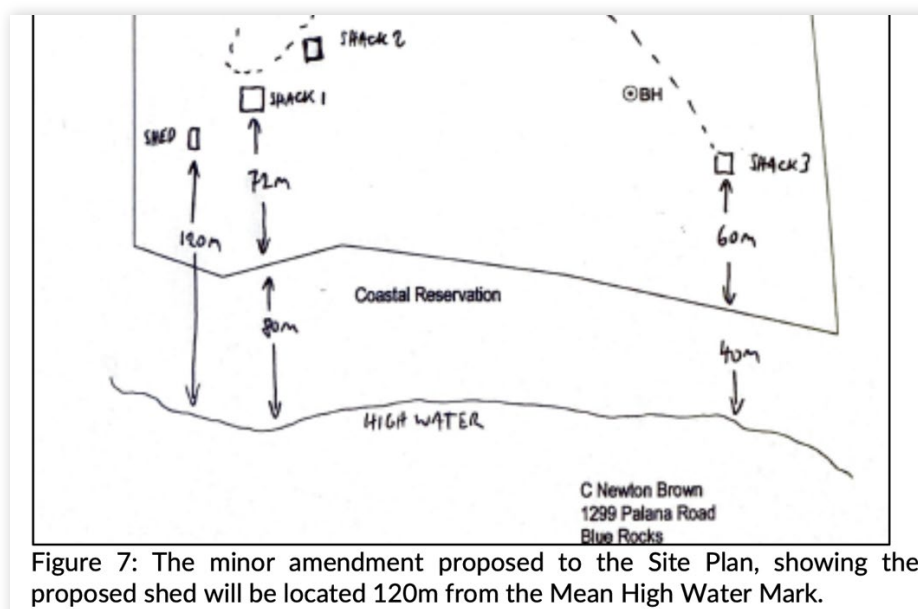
excerpt of the 2025 Minor Amendment Assessment showing the amendment to the site plan that was approved in January 2025.
